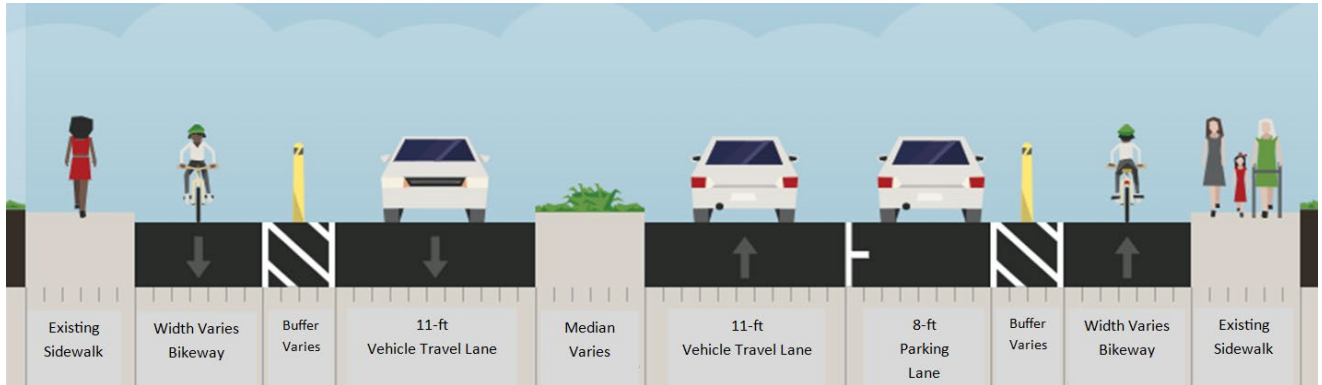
Typical Cross-Section E. Park Drive to Trophy Drive
